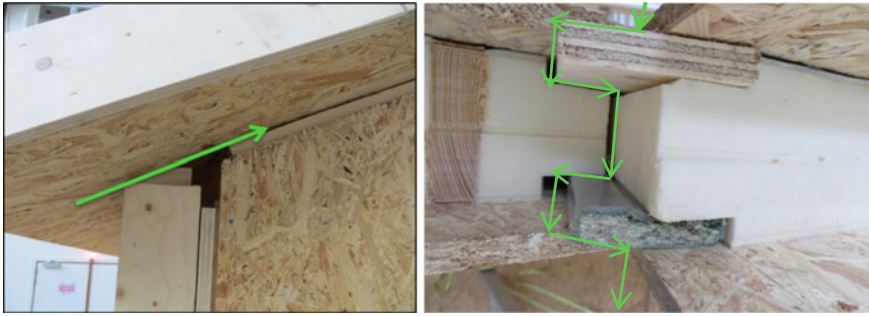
Left* Section of the roof–wall junction. *Right* Picture of the wall–wall junction with grey PVC foam brace at the inside. The expected air infiltration path from outside to inside is indicated with a *green arrow
